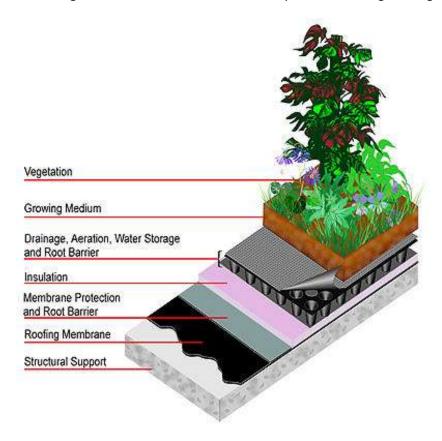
Typical green roof cross section (Source: City of Chattanooga et al., 2008)
